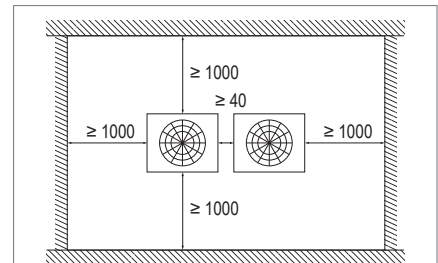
Minimum distances for the heat pump Q (dimensions in mm)
